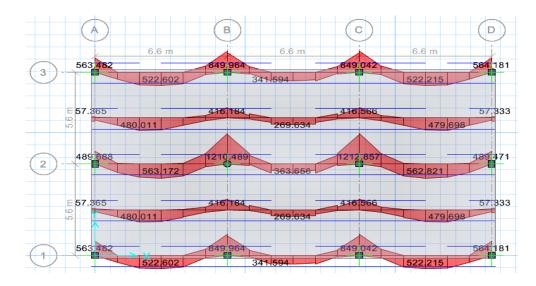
Along longer side reinforcement(SAFE:ACI, without staggered column)
